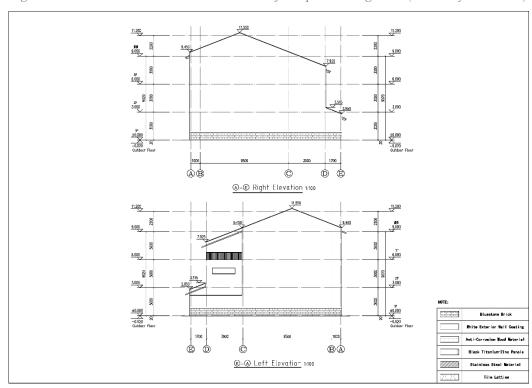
The Right Elevation and Left Elevation of Sample Building No. 1 (Drawn by the author)
